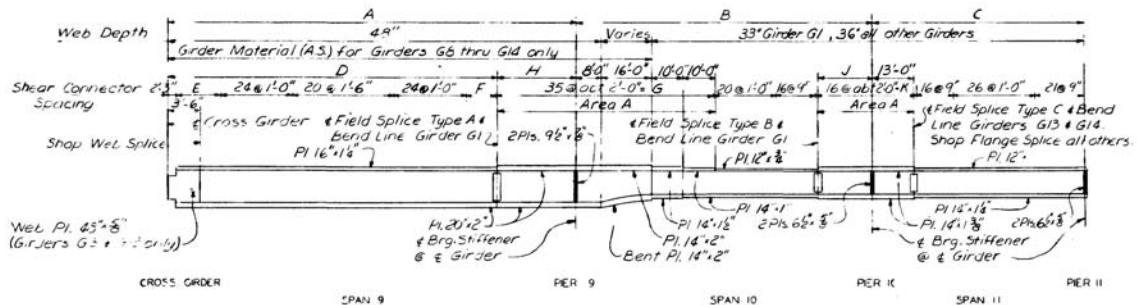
Plate girders in south approach span (from Mn/DOT 2008).
